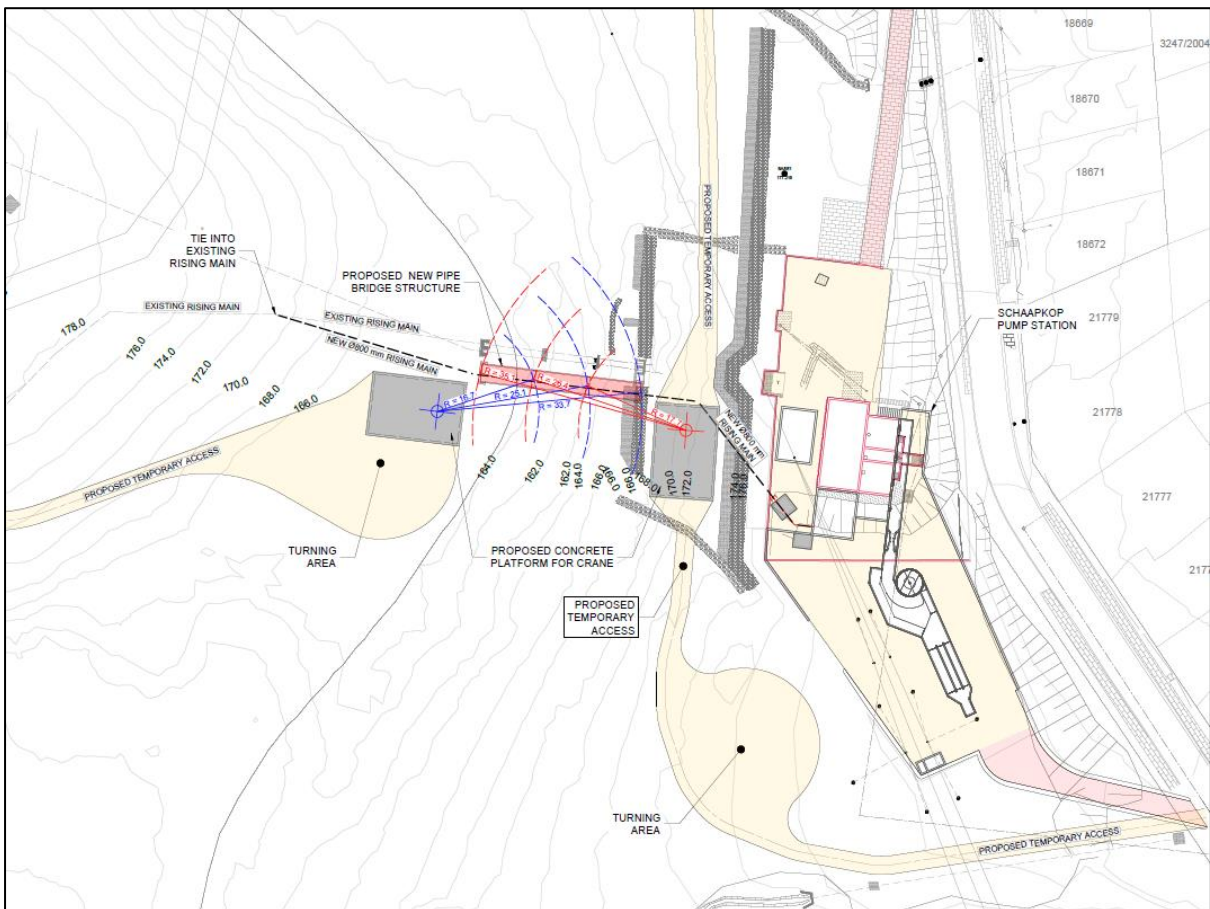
Excerpt from the site layout plan of the extent of works (iX engineers, November 2023)
